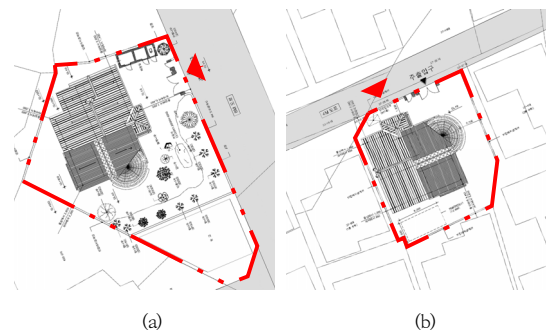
Site plan of the Eclectic-style House in Daeheung-dong
